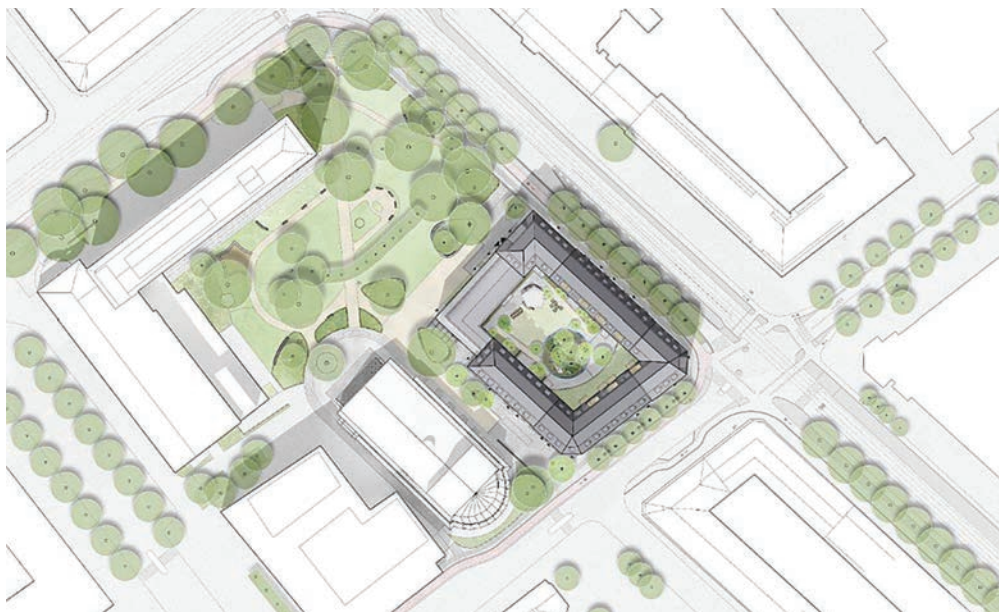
Illustration from detailed development plan 2024 shows the settlement surrounded by new tree planting through compensation. Source: *Detaljplan för bostäder och verksamheter vid Lorensbergsparken inom stadsdelen Lorensberg*, Göteborgs stad, 2024.
